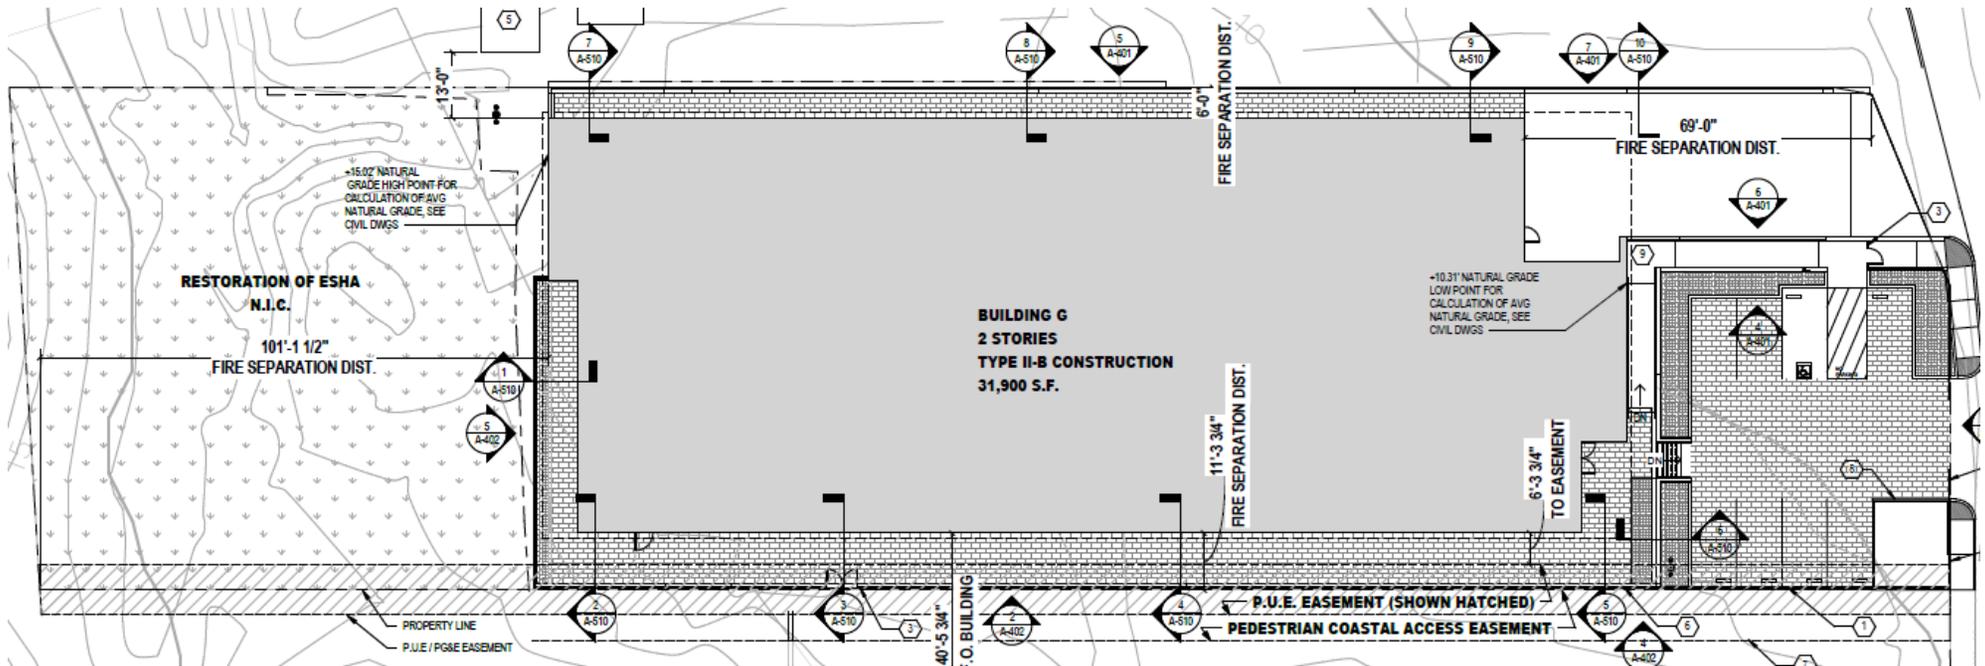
(above): Site Plan of proposed Building G, habitat restoration area, and parking site improvements, including the planters and parking lot. (Source IX.1)
